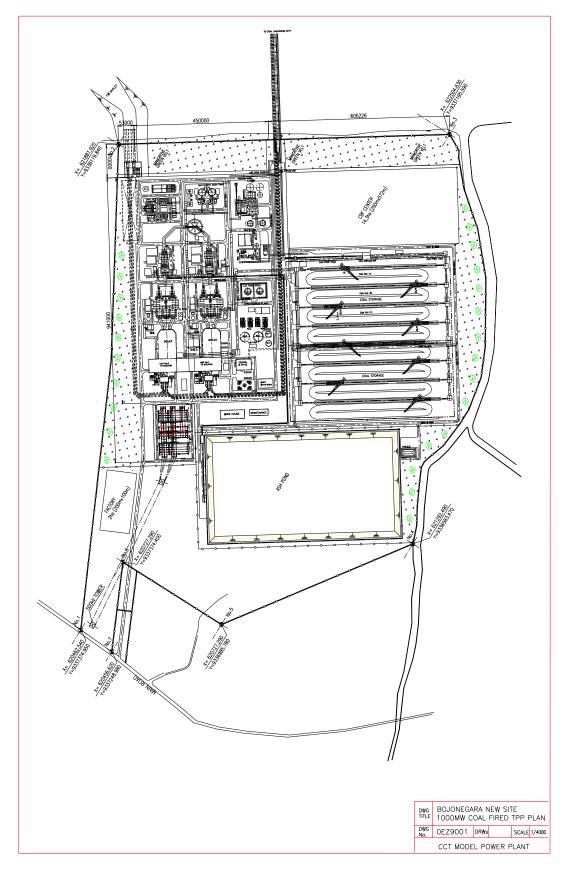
General layout for Planed Coal Fired Power Plant
